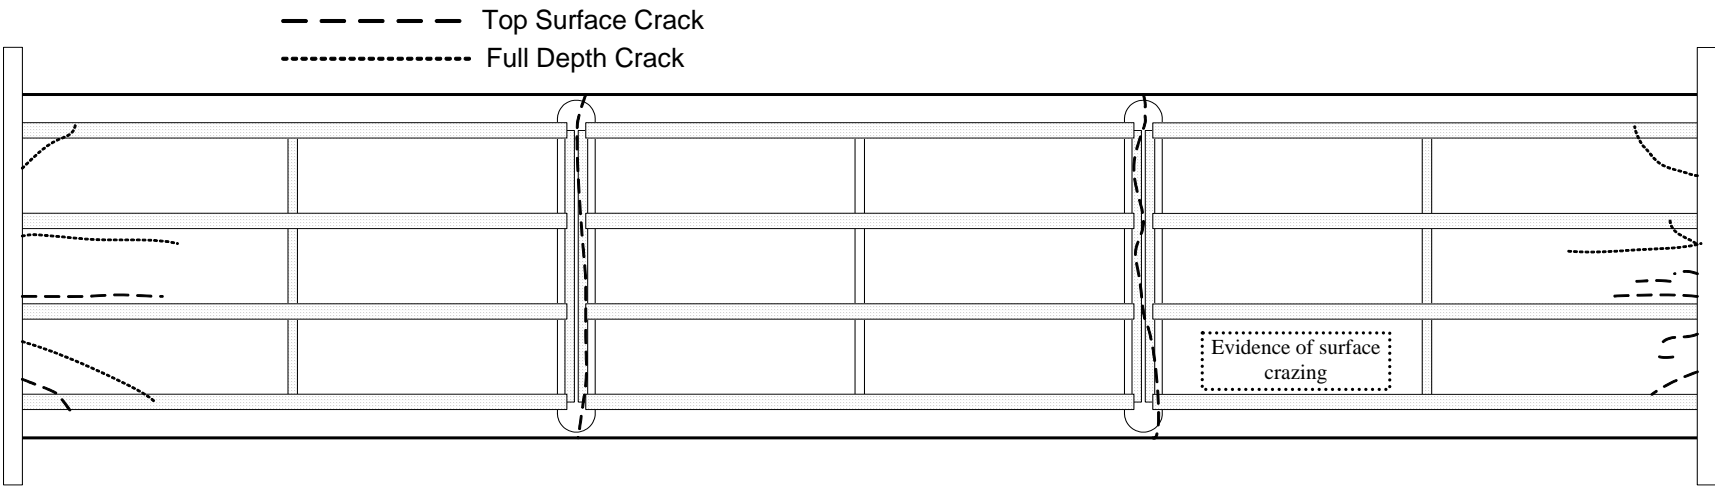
Detailed Map of Crack Survey on the Empirical Bridge Deck
